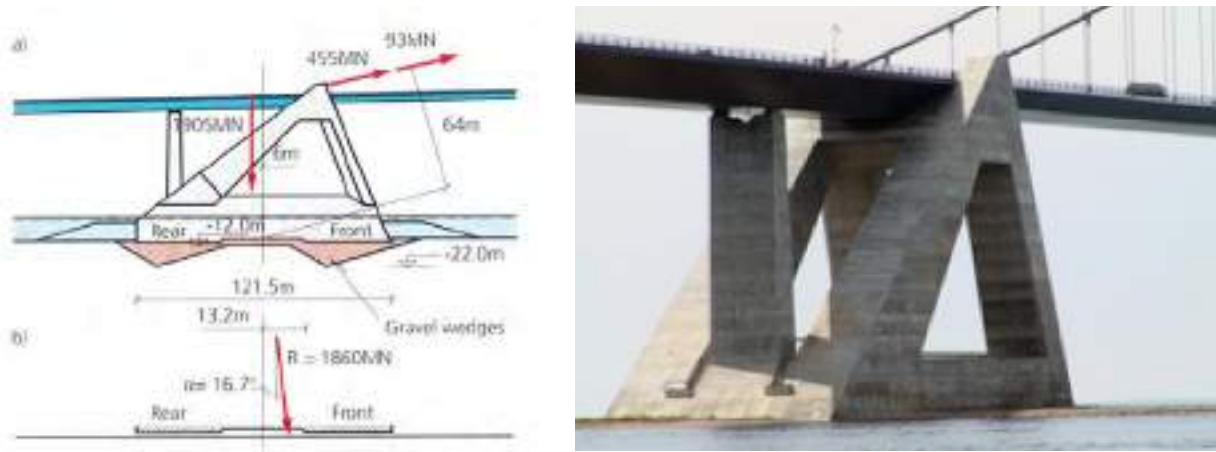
Anchor Block Structure - 1624 m main suspension span.
